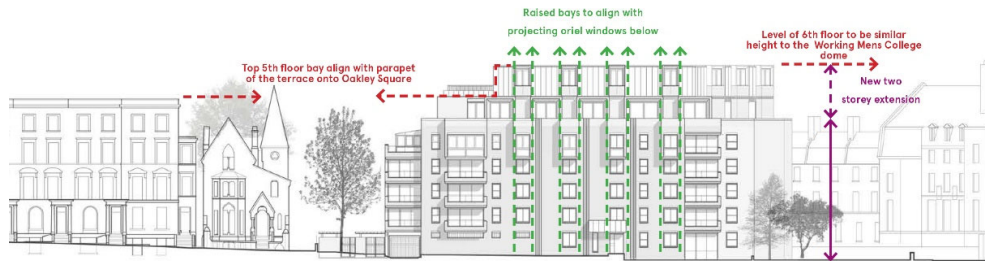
Proposed Oakley Square elevation, concept diagram. See DAS for larger image page 27
